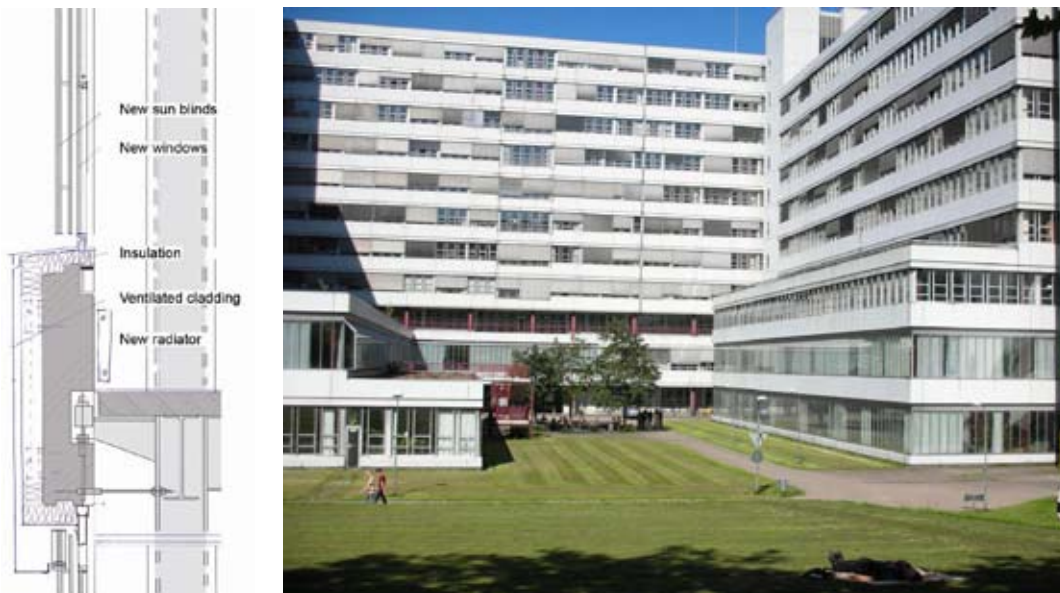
Principle Section of the ‘Ventilated Cladding’; Impression of the current façade
